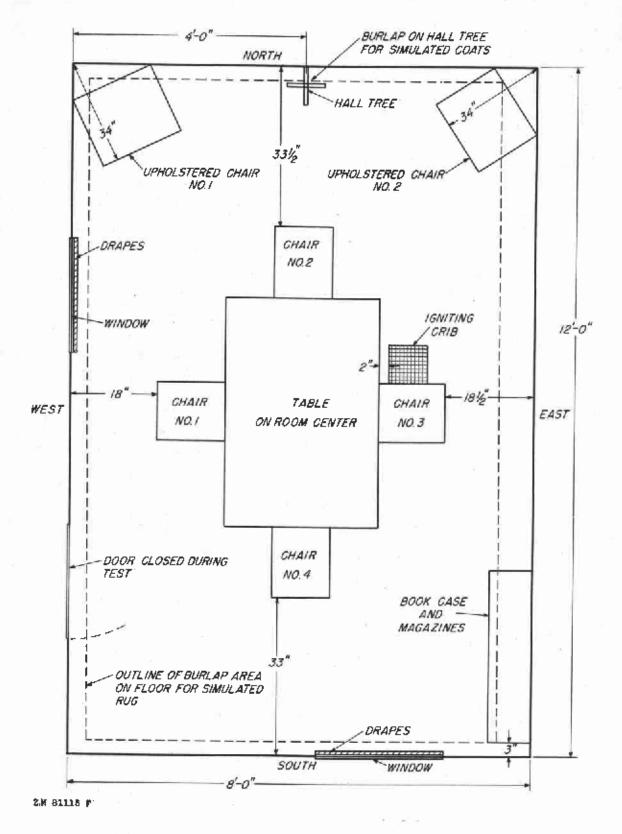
Dwelling room burn-out test. Diagram of furniture arrangement in room.
